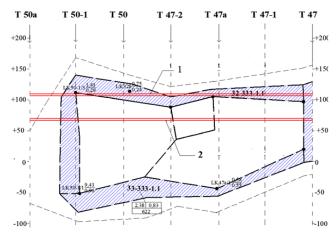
Longitudinal cross-section of the current status diagram of the design area: 1 – ventilation level at +110; 2 – haulage level at +70
